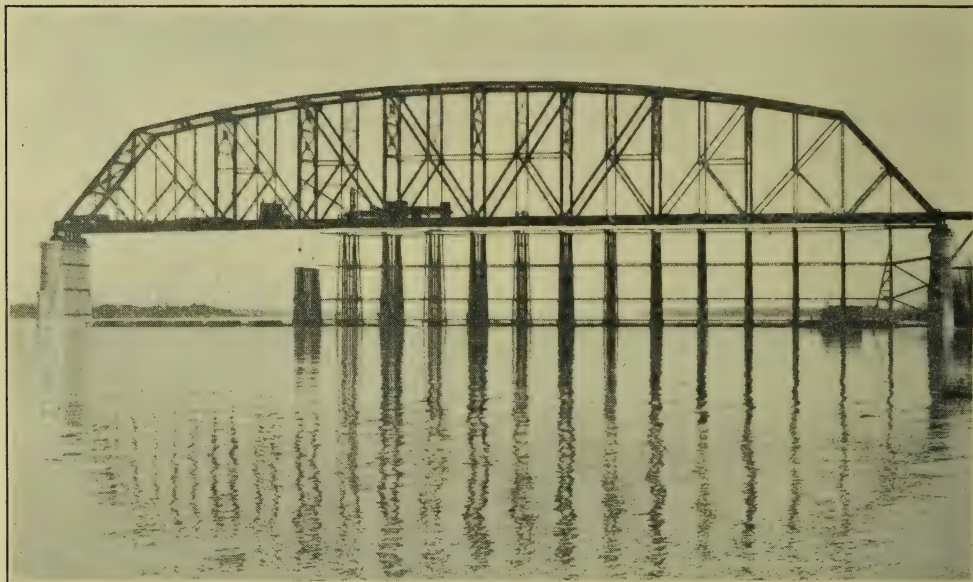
Metropolis 720-Foot Span, the Longest Simple Truss Ever Built
